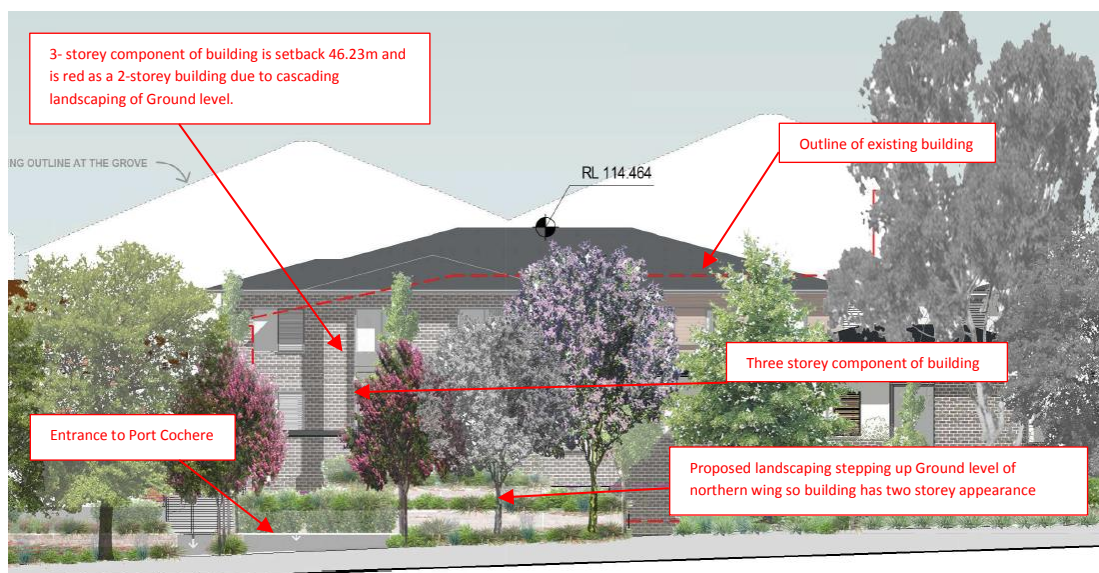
Extract from Streetscape Elevation (North East) with existing and proposed planting. Source-Group GSA
